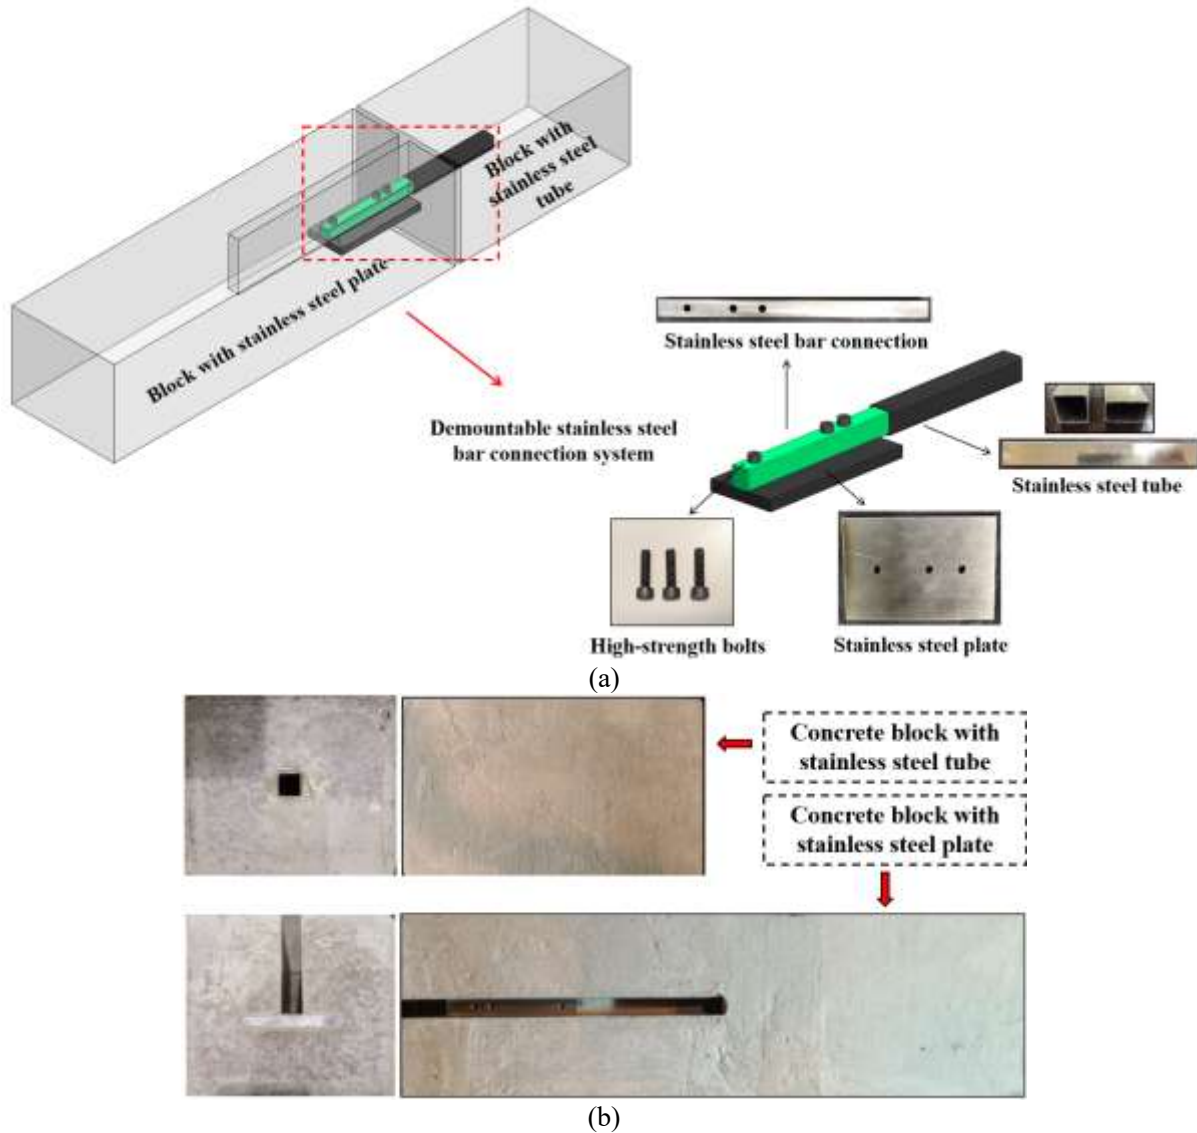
Concrete blocks with demountable stainless steel bar connection system (a) configuration, (b) concrete blocks.
